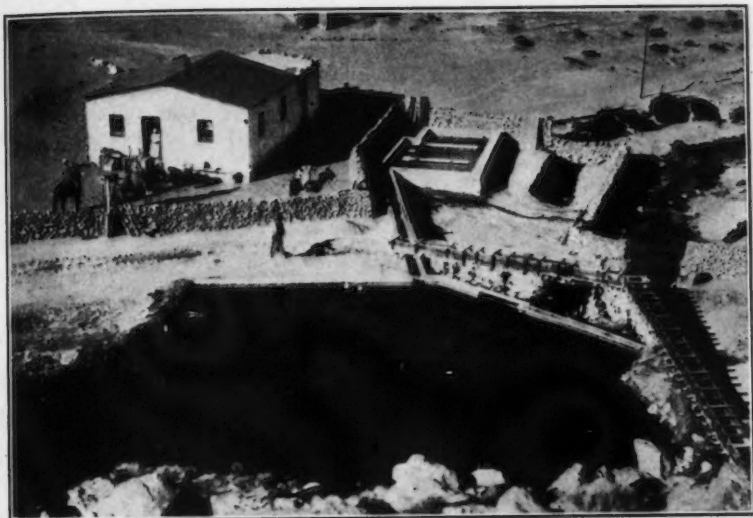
VIEW SHOWING SMALL CANAL CARRYING WATER TO SETTLING BASIN AT INTAKE OF PIPE LINE.
